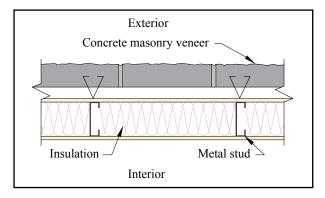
Concrete Masonry Veneer with Steel Stud Backup
